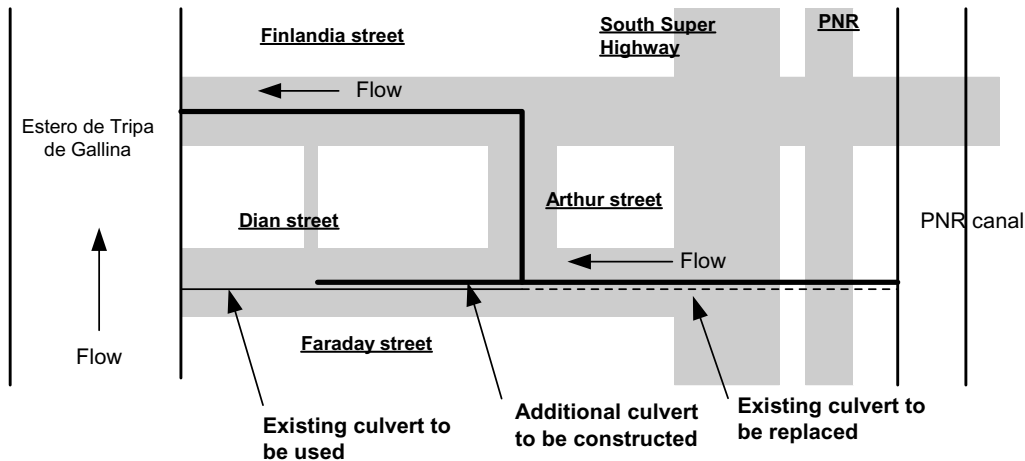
Existing and Additional Proposed Route of Faraday Drainage Main
